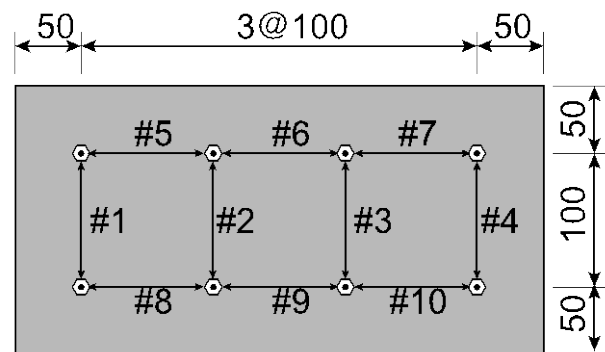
Arrangement of plugs for measuring expansion (unit: mm)
